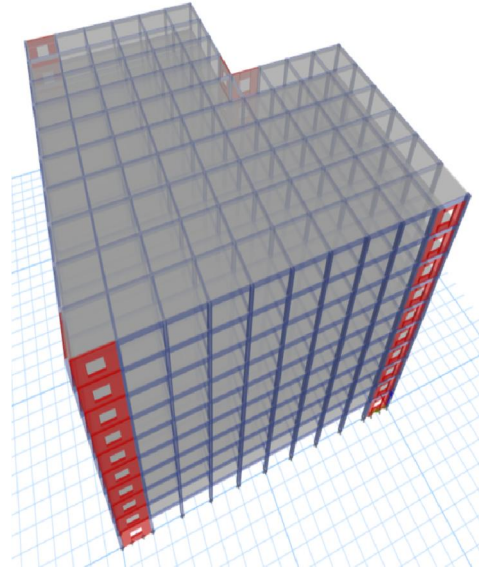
L-Shape Opening in Shear wall (Opening)
